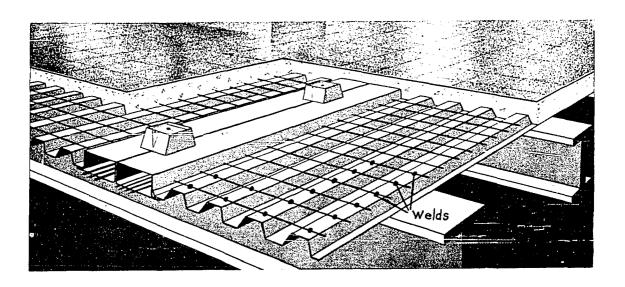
Example of CATEGORY II - Steel deck utilizing deformed wires welded to the top of deck (Courtesy of the Granco Steel Company)
